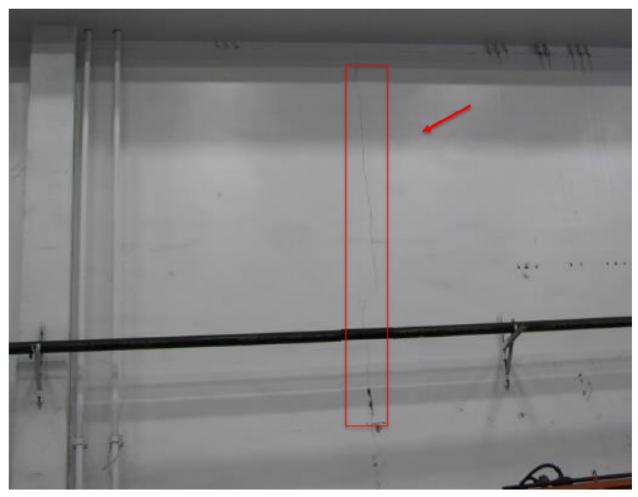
Crack in CMU wall in Unit 4 Substation Building
